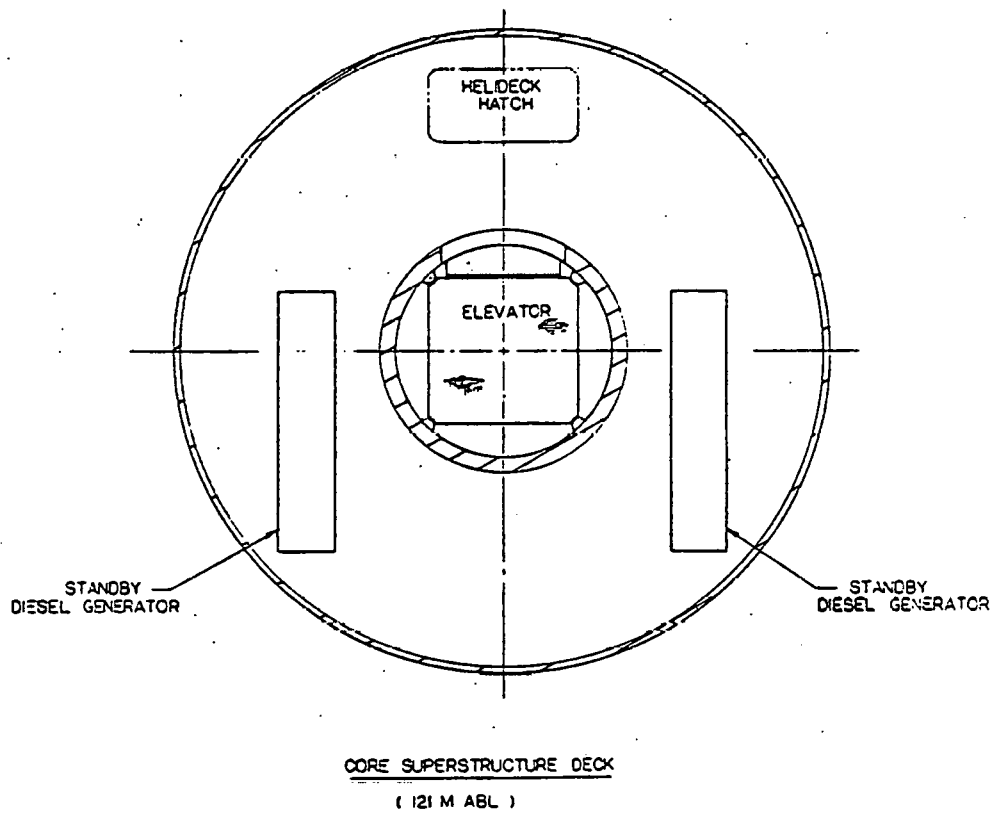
Standby Power and Auxiliary Electrical Equipment Arrangement, 400-MW(e) Spar, Core Superstructure Deck
